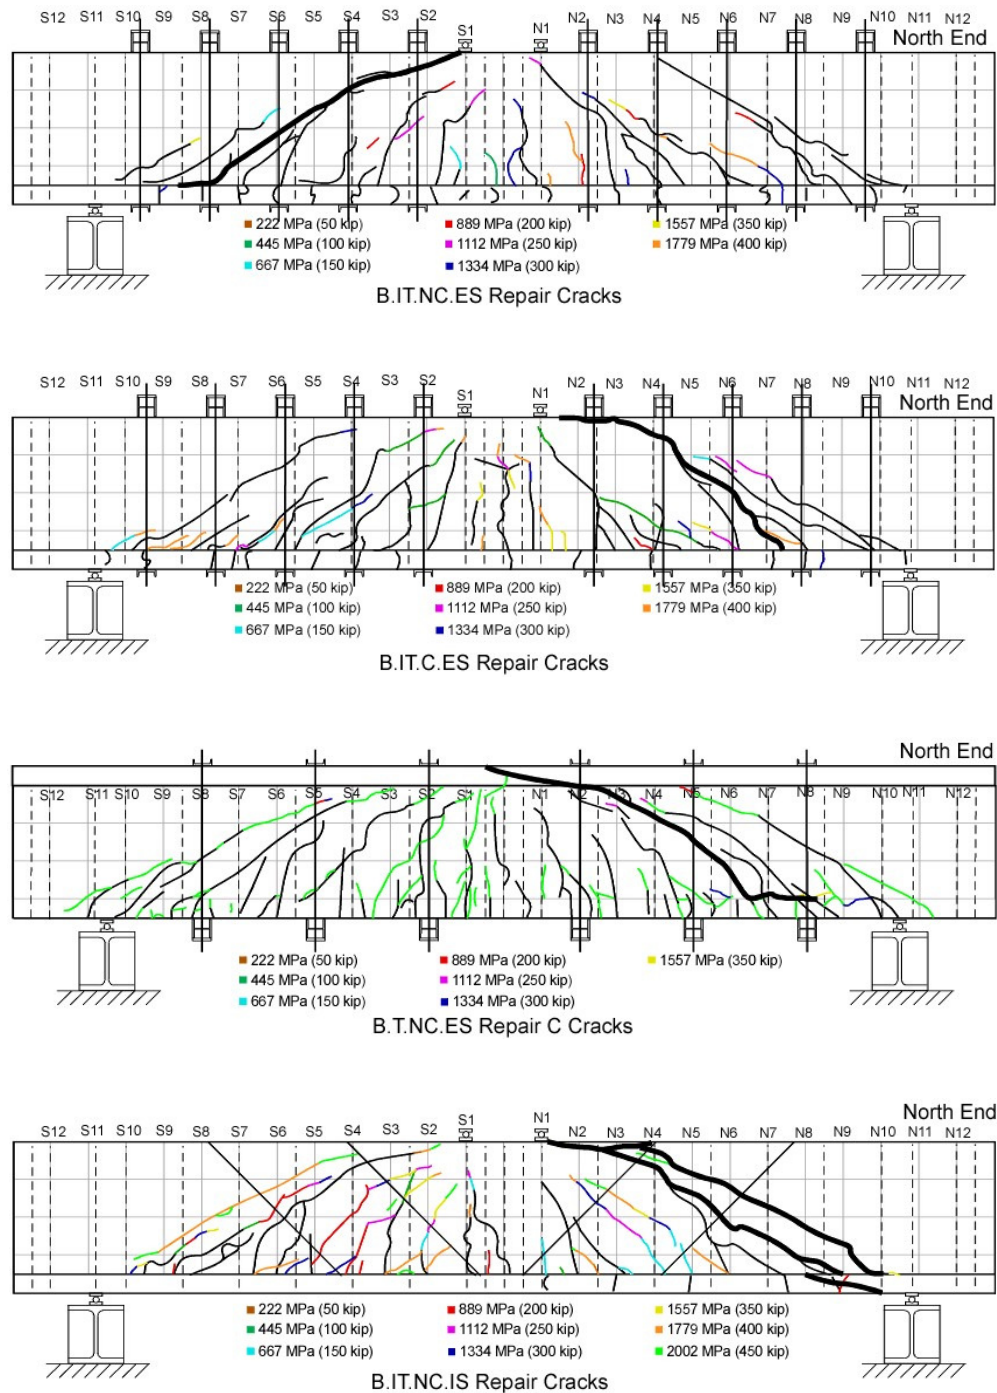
Beam specimen crack maps: individual load steps indicated
